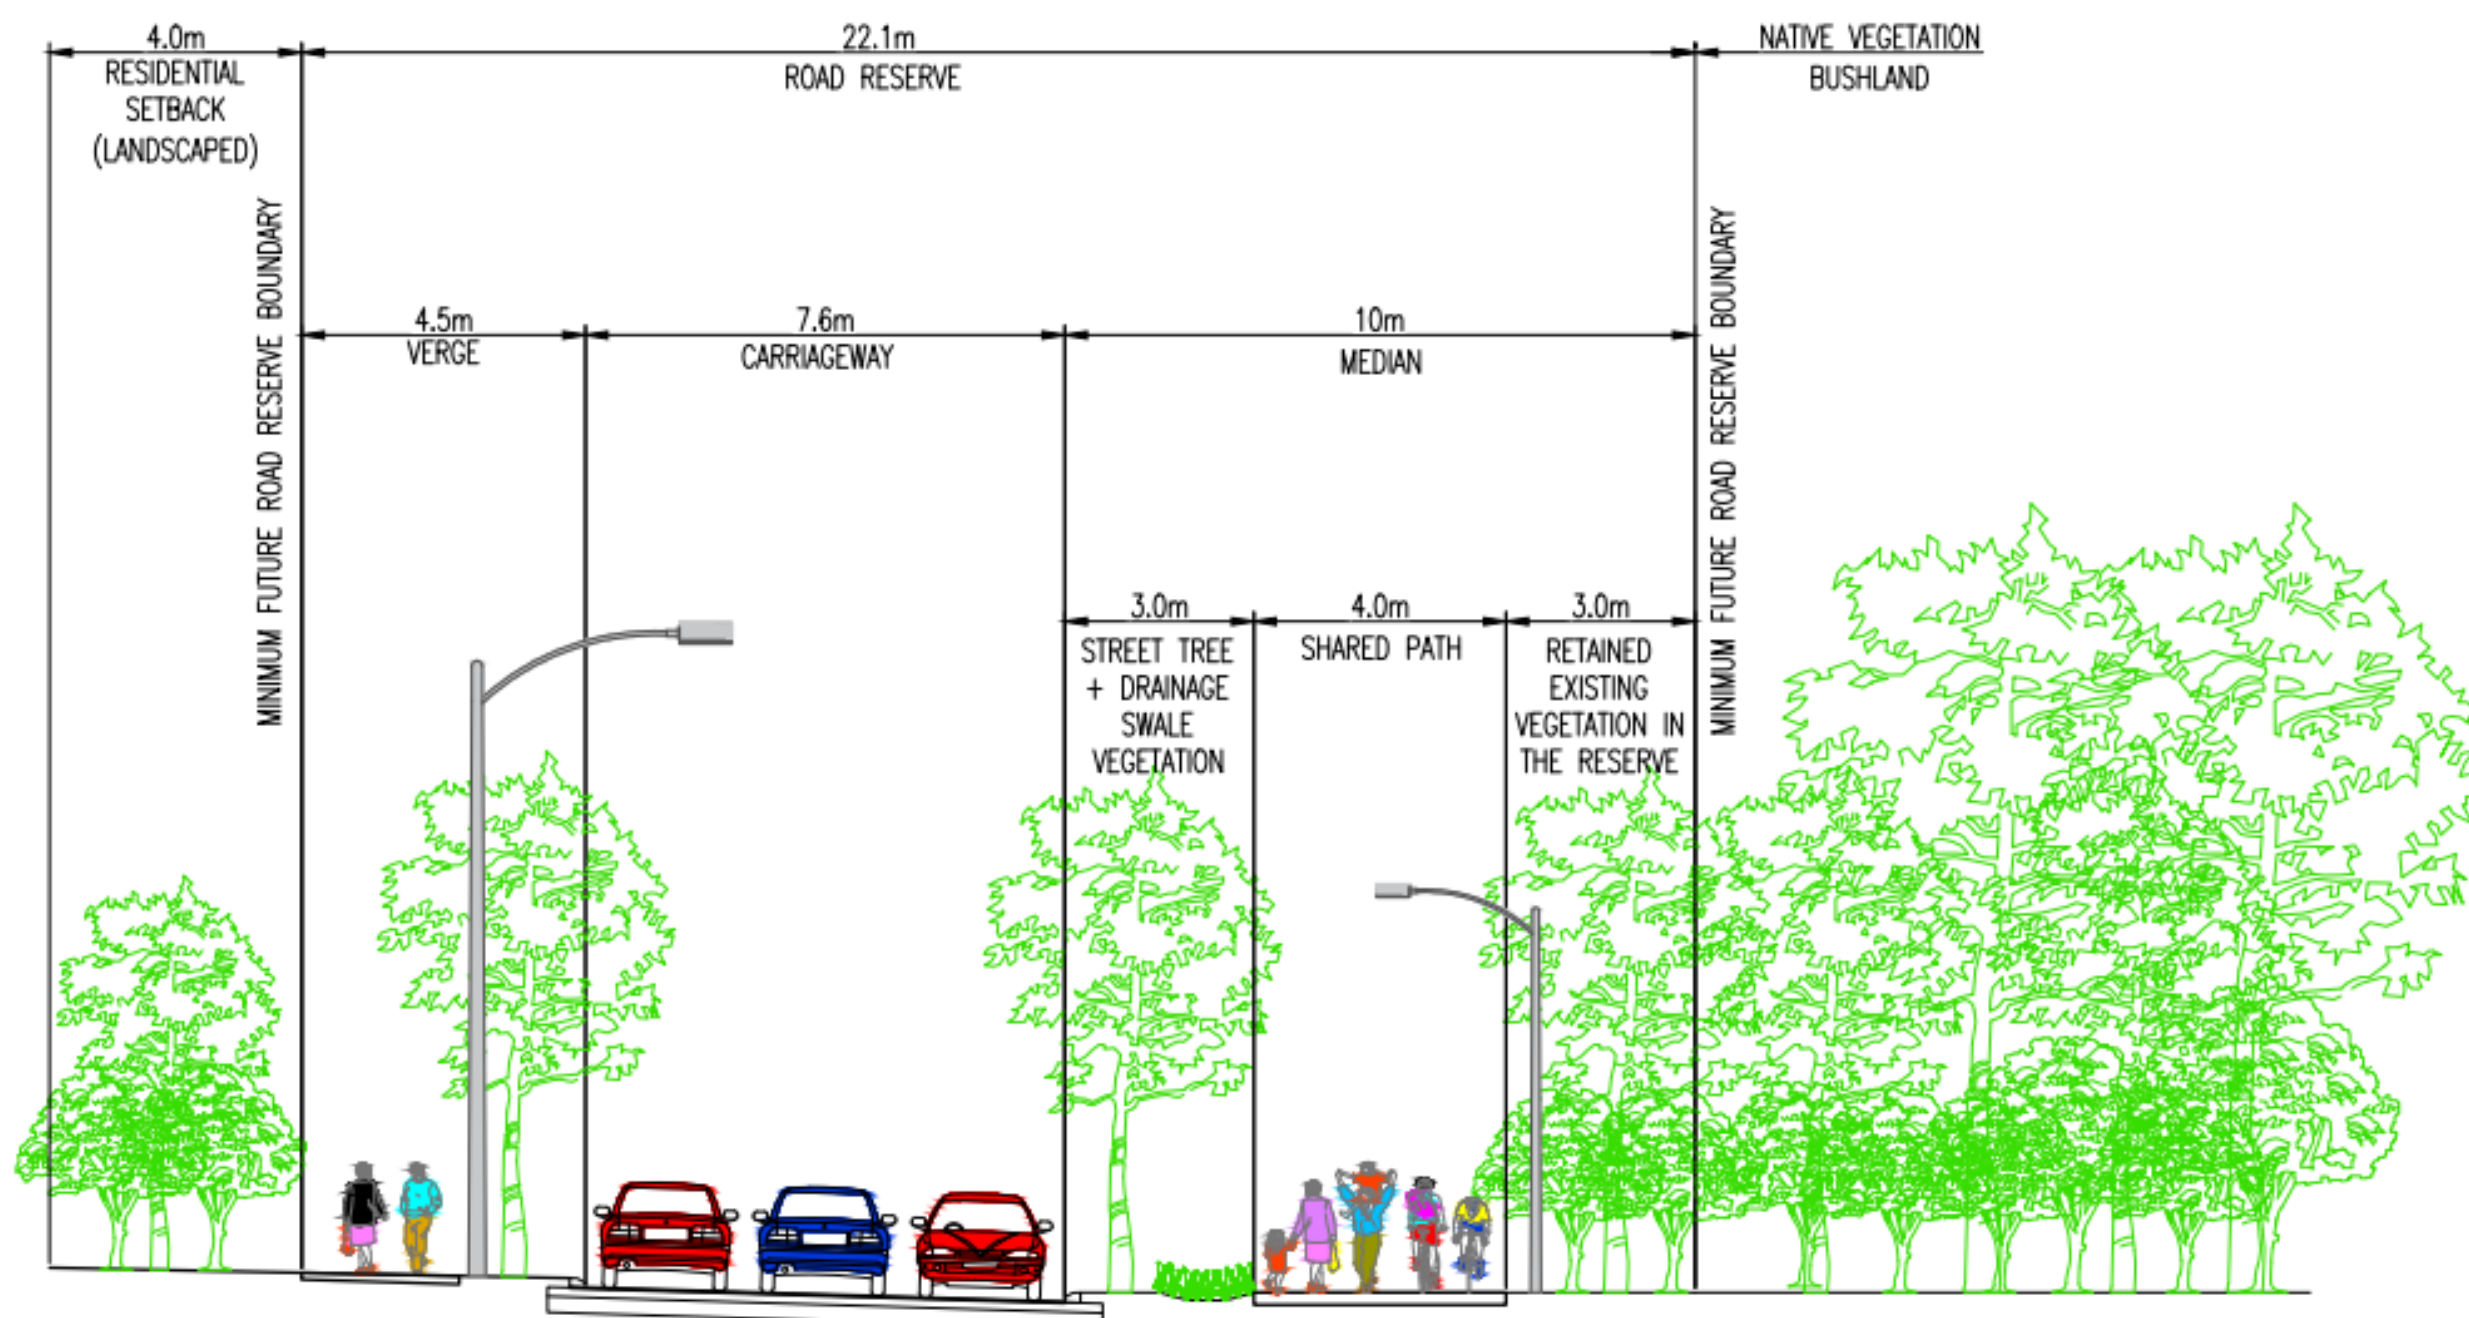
CROSS SECTION OF LANDSCAPE BOULEVARDS
